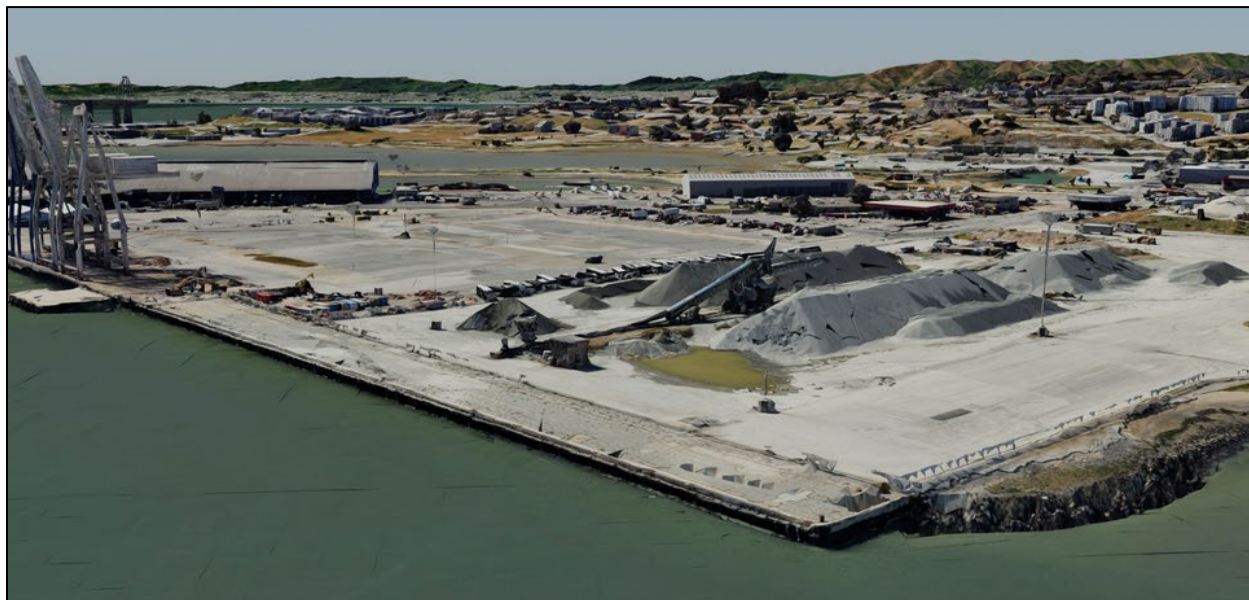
Pier 94 Mooring and Fendering – Current Condition
